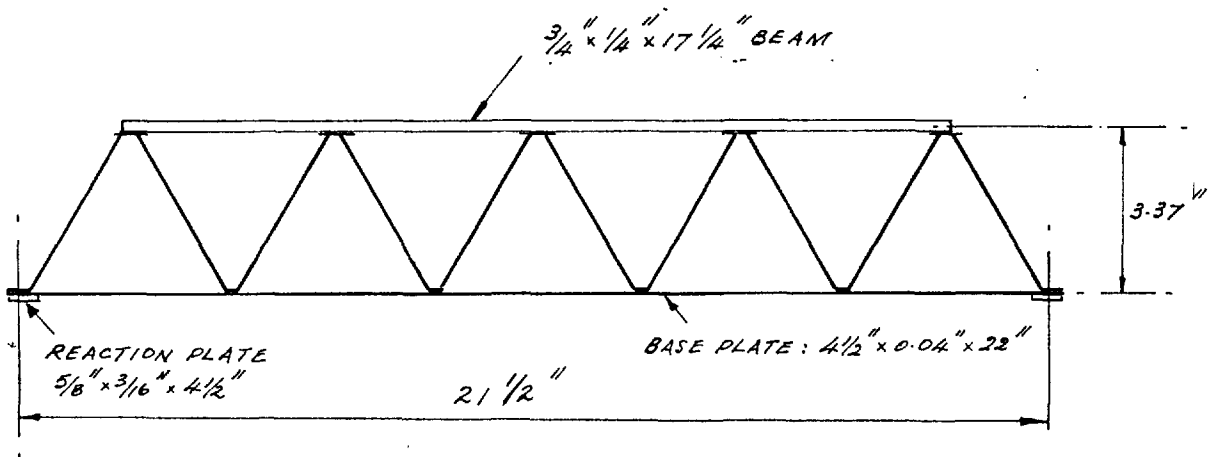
LOADING ARRANGEMENT FOR TESTS ON MODELS A, B & C
